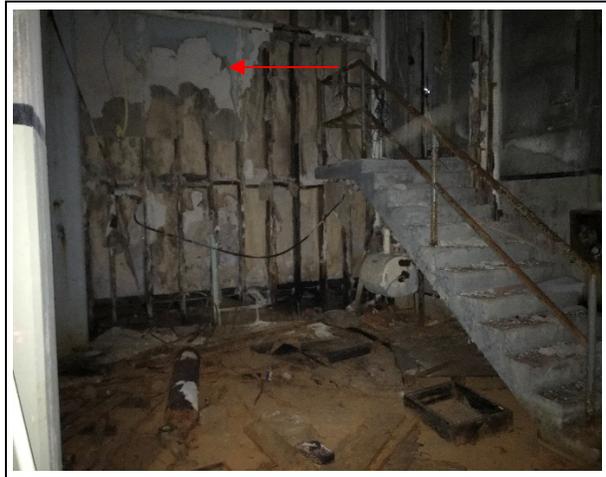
Building 3 – asbestos-containing (2% chrysotile) drywall joint-fill compound located in the storage room
